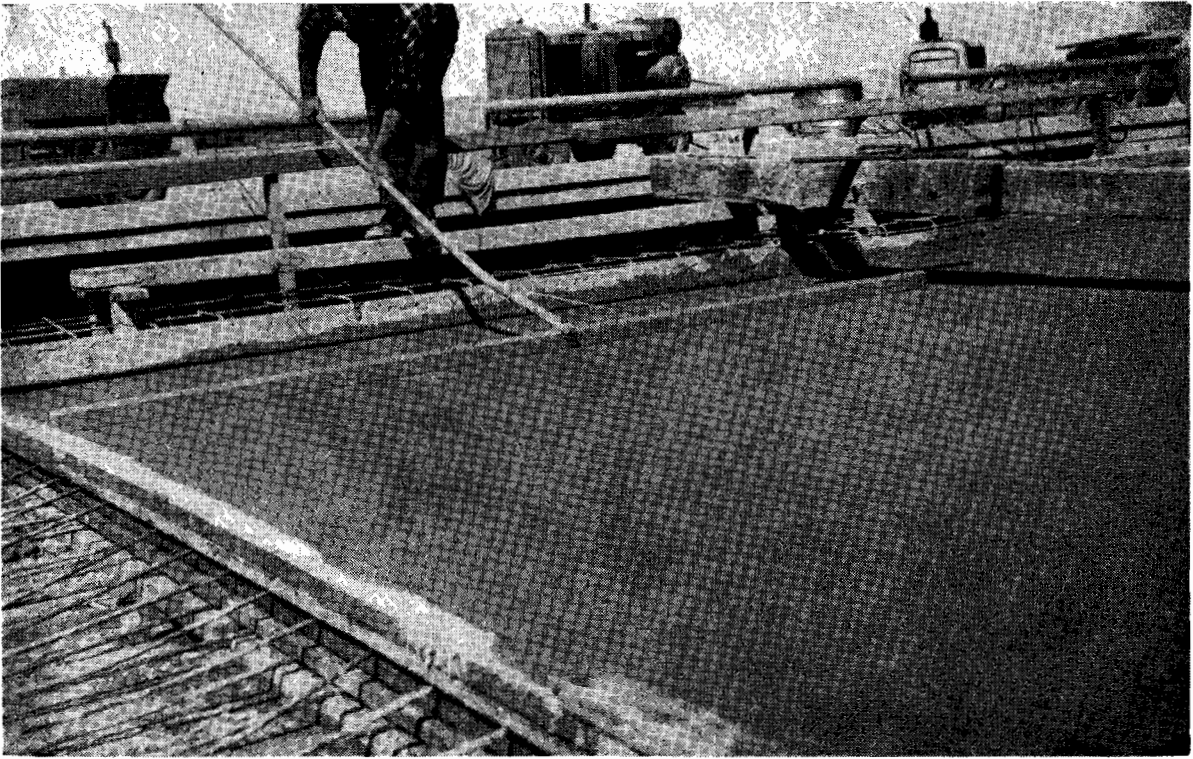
Checking a connexion of finished deck surface using 10-ft. aluminium straight edge.
